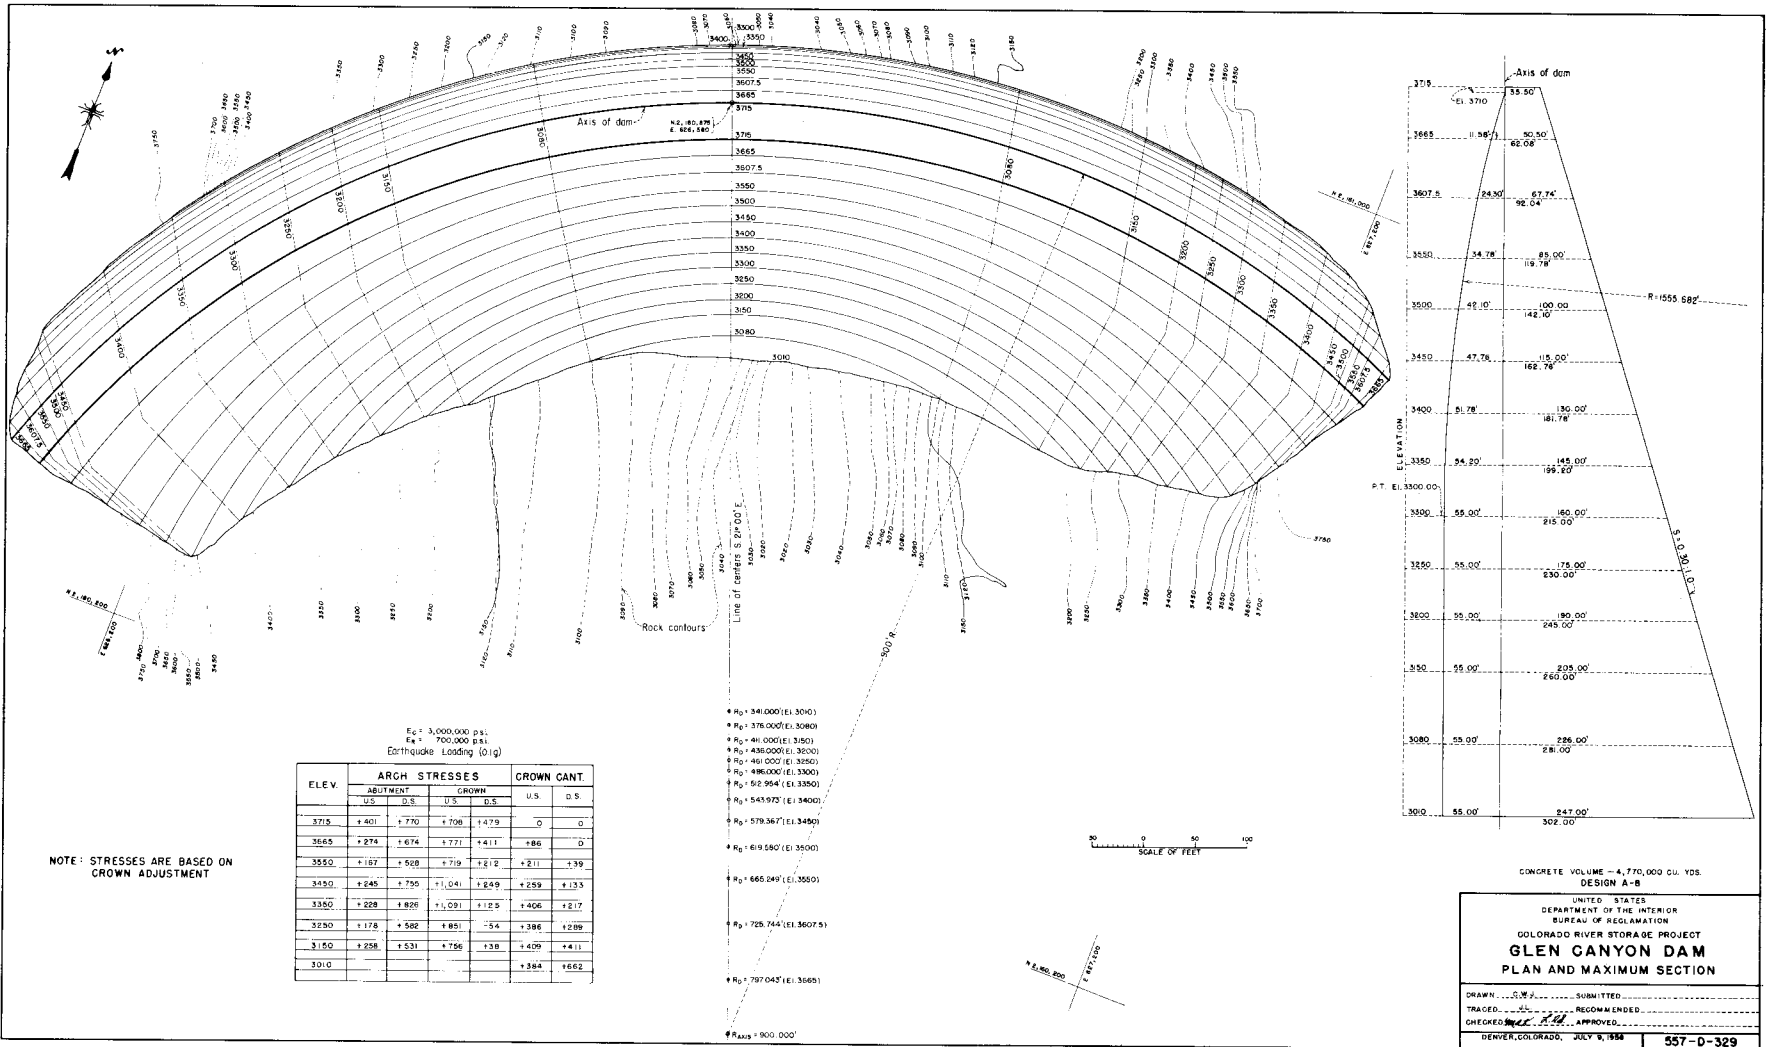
Dam design A-8 (specifications design)—Plan and maximum section.
